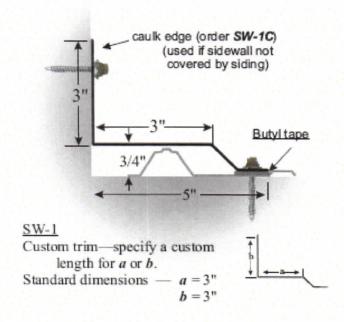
Sidewall flashing is applied when the side of the roof butts up against an adjacent wall. The wall-side of the flashing can either be covered over with siding or sealed with caulk (order SW-1C). Butyl tape should be applied where the "foot" of the flashing attaches to the roof.
